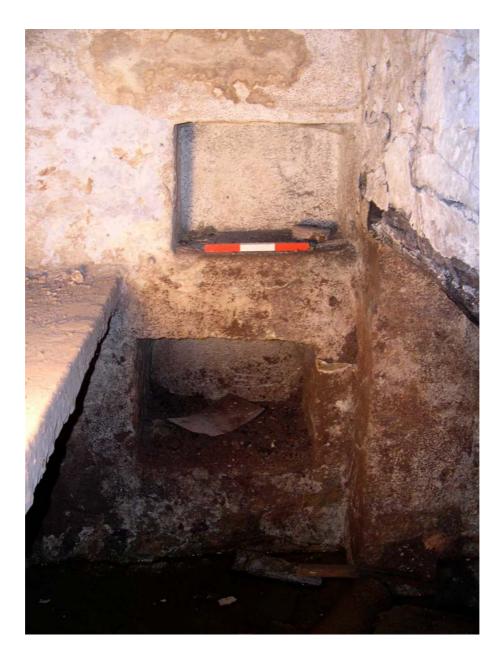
Alcoves in west elevation of ground floor Room ${\bf 6}$
